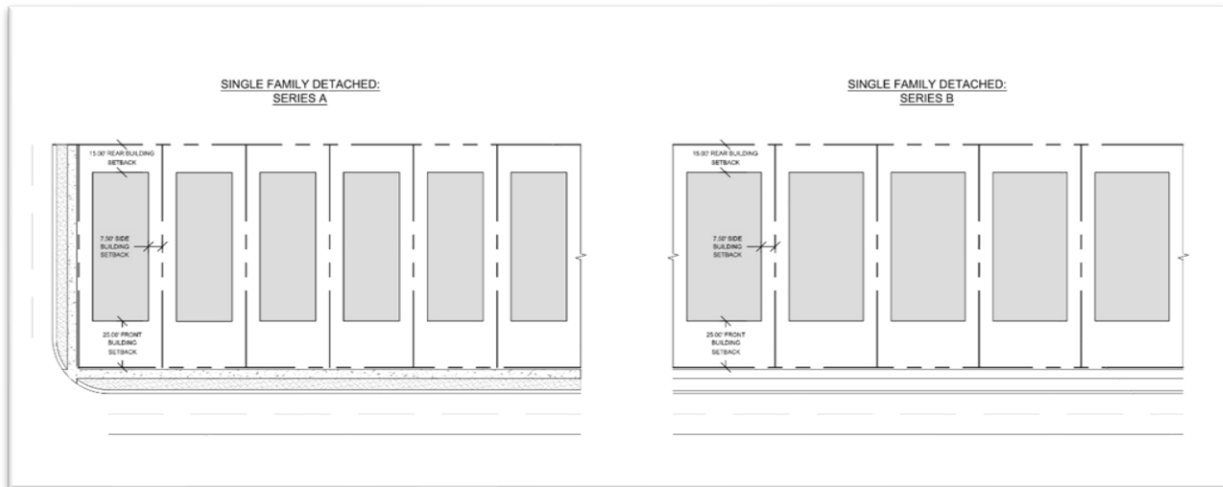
Showing building setback spacing for single family detached (Series A&B)
